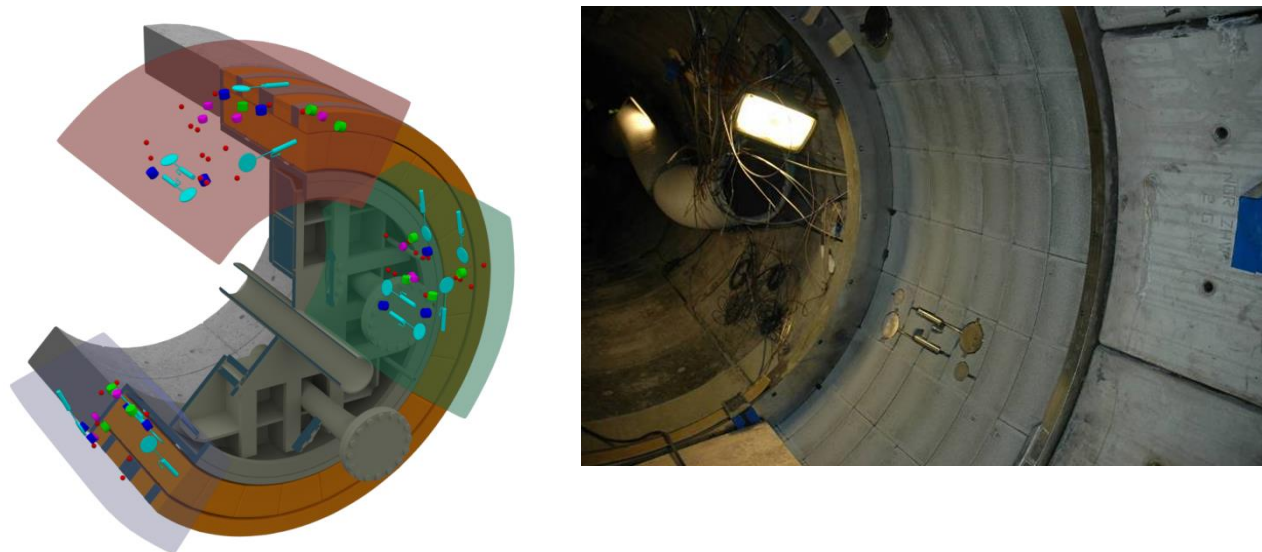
Instrumented Seal – left: cut-out view - right: pressure cells at inside of bentonite ring
